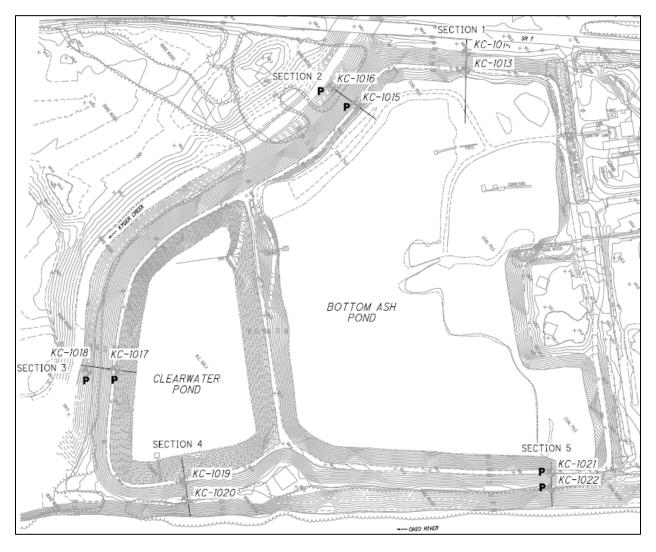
Kyger Creek Station Boiler Slag Pond – Plan View of Cross Sections (DLZ, 2015)
